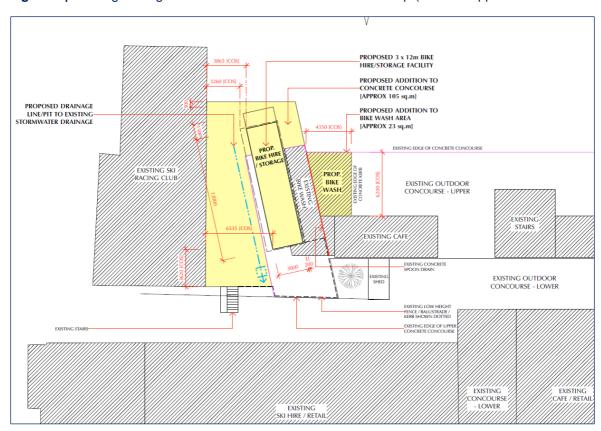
| Detail of works to facilitate bike storage facility (Source: Applicant's documentation)
